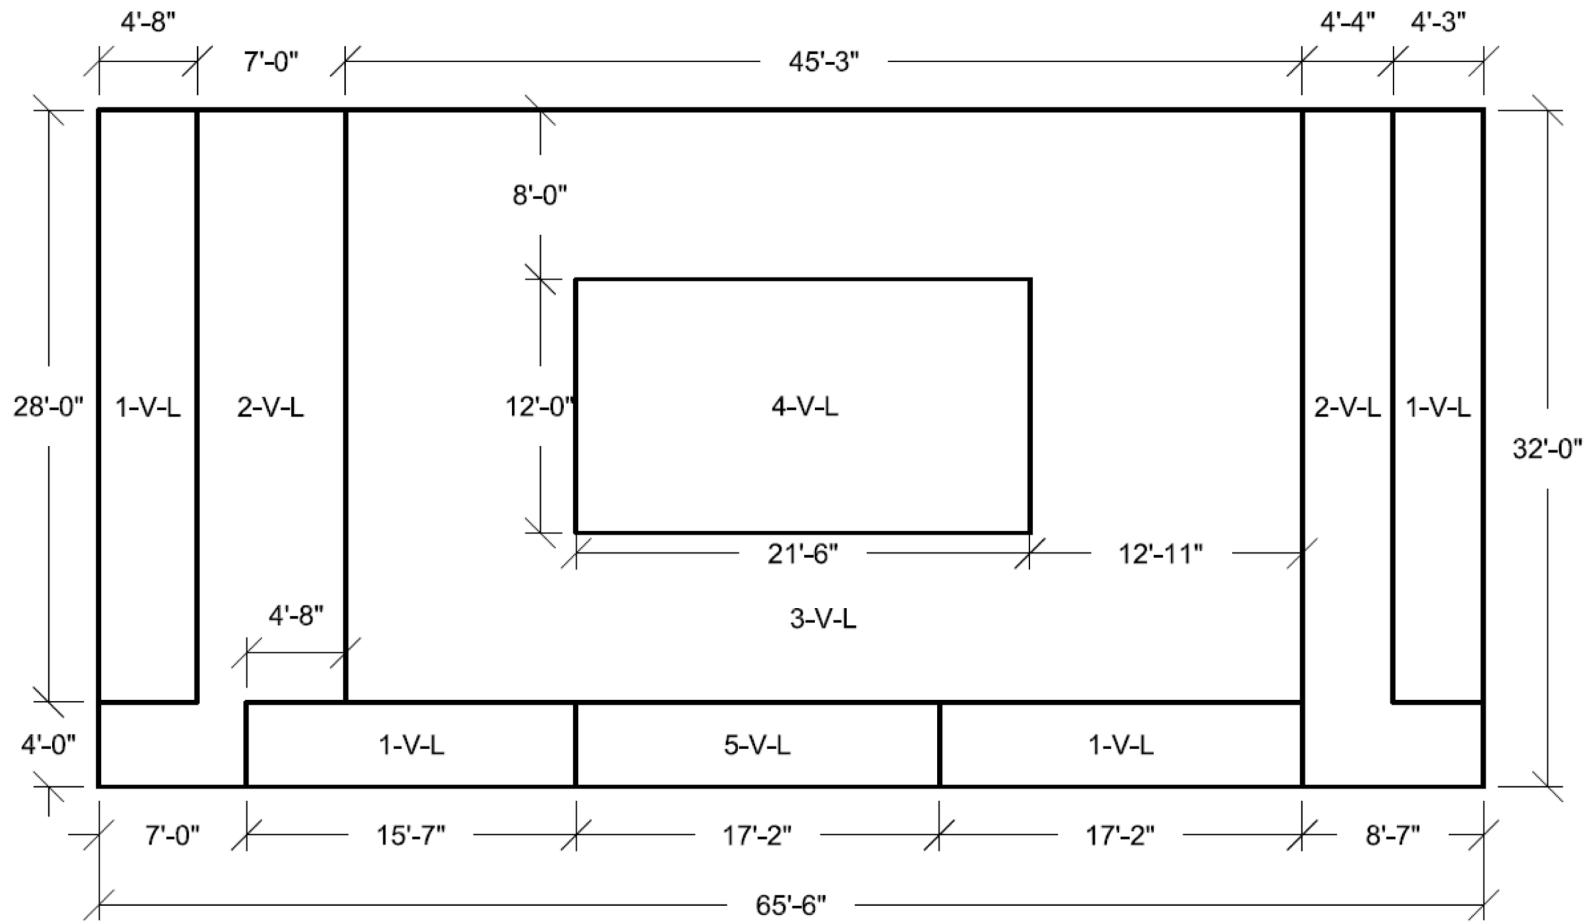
H.6-171 DGFOSV Wall 8 Looking From Outside
